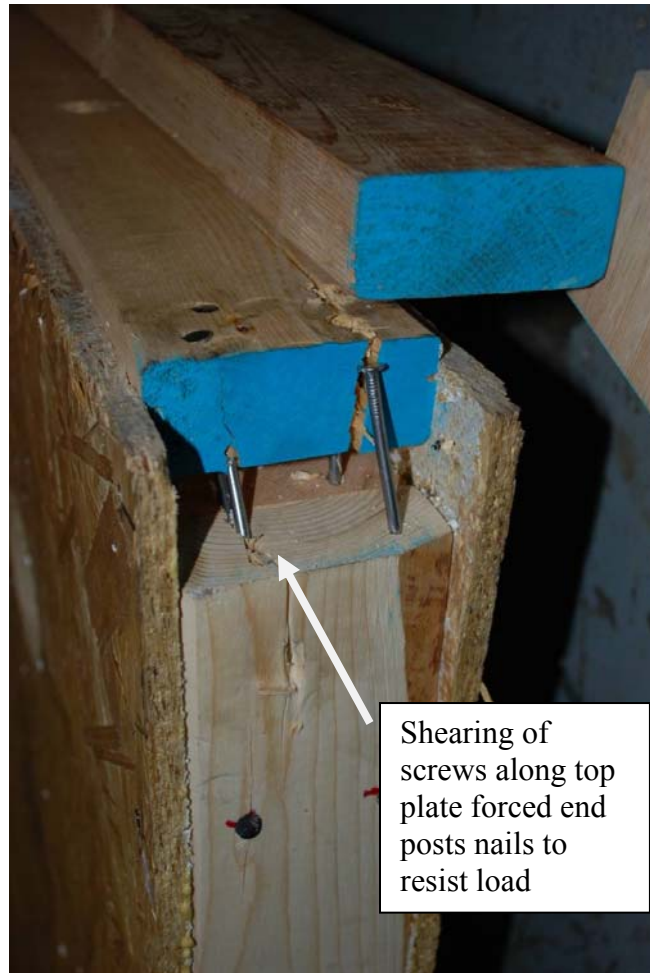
Top plate failure (Specimen A4-1M) occurred at the end where (4) 16d common nails were used to attach top plate to end posts (Picture taken after wall was removed from facility)
